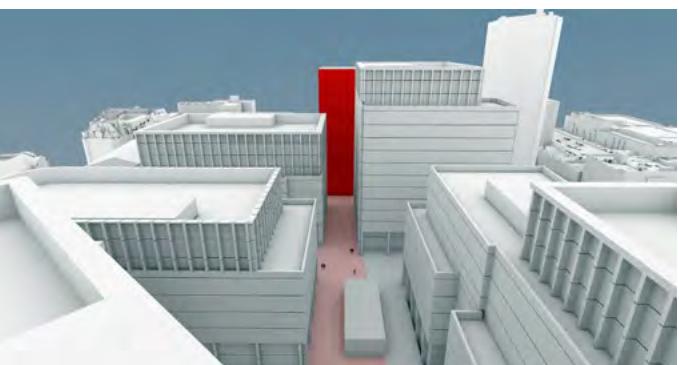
REV A: Axes 2 – Visual connection with Hotel's façade
